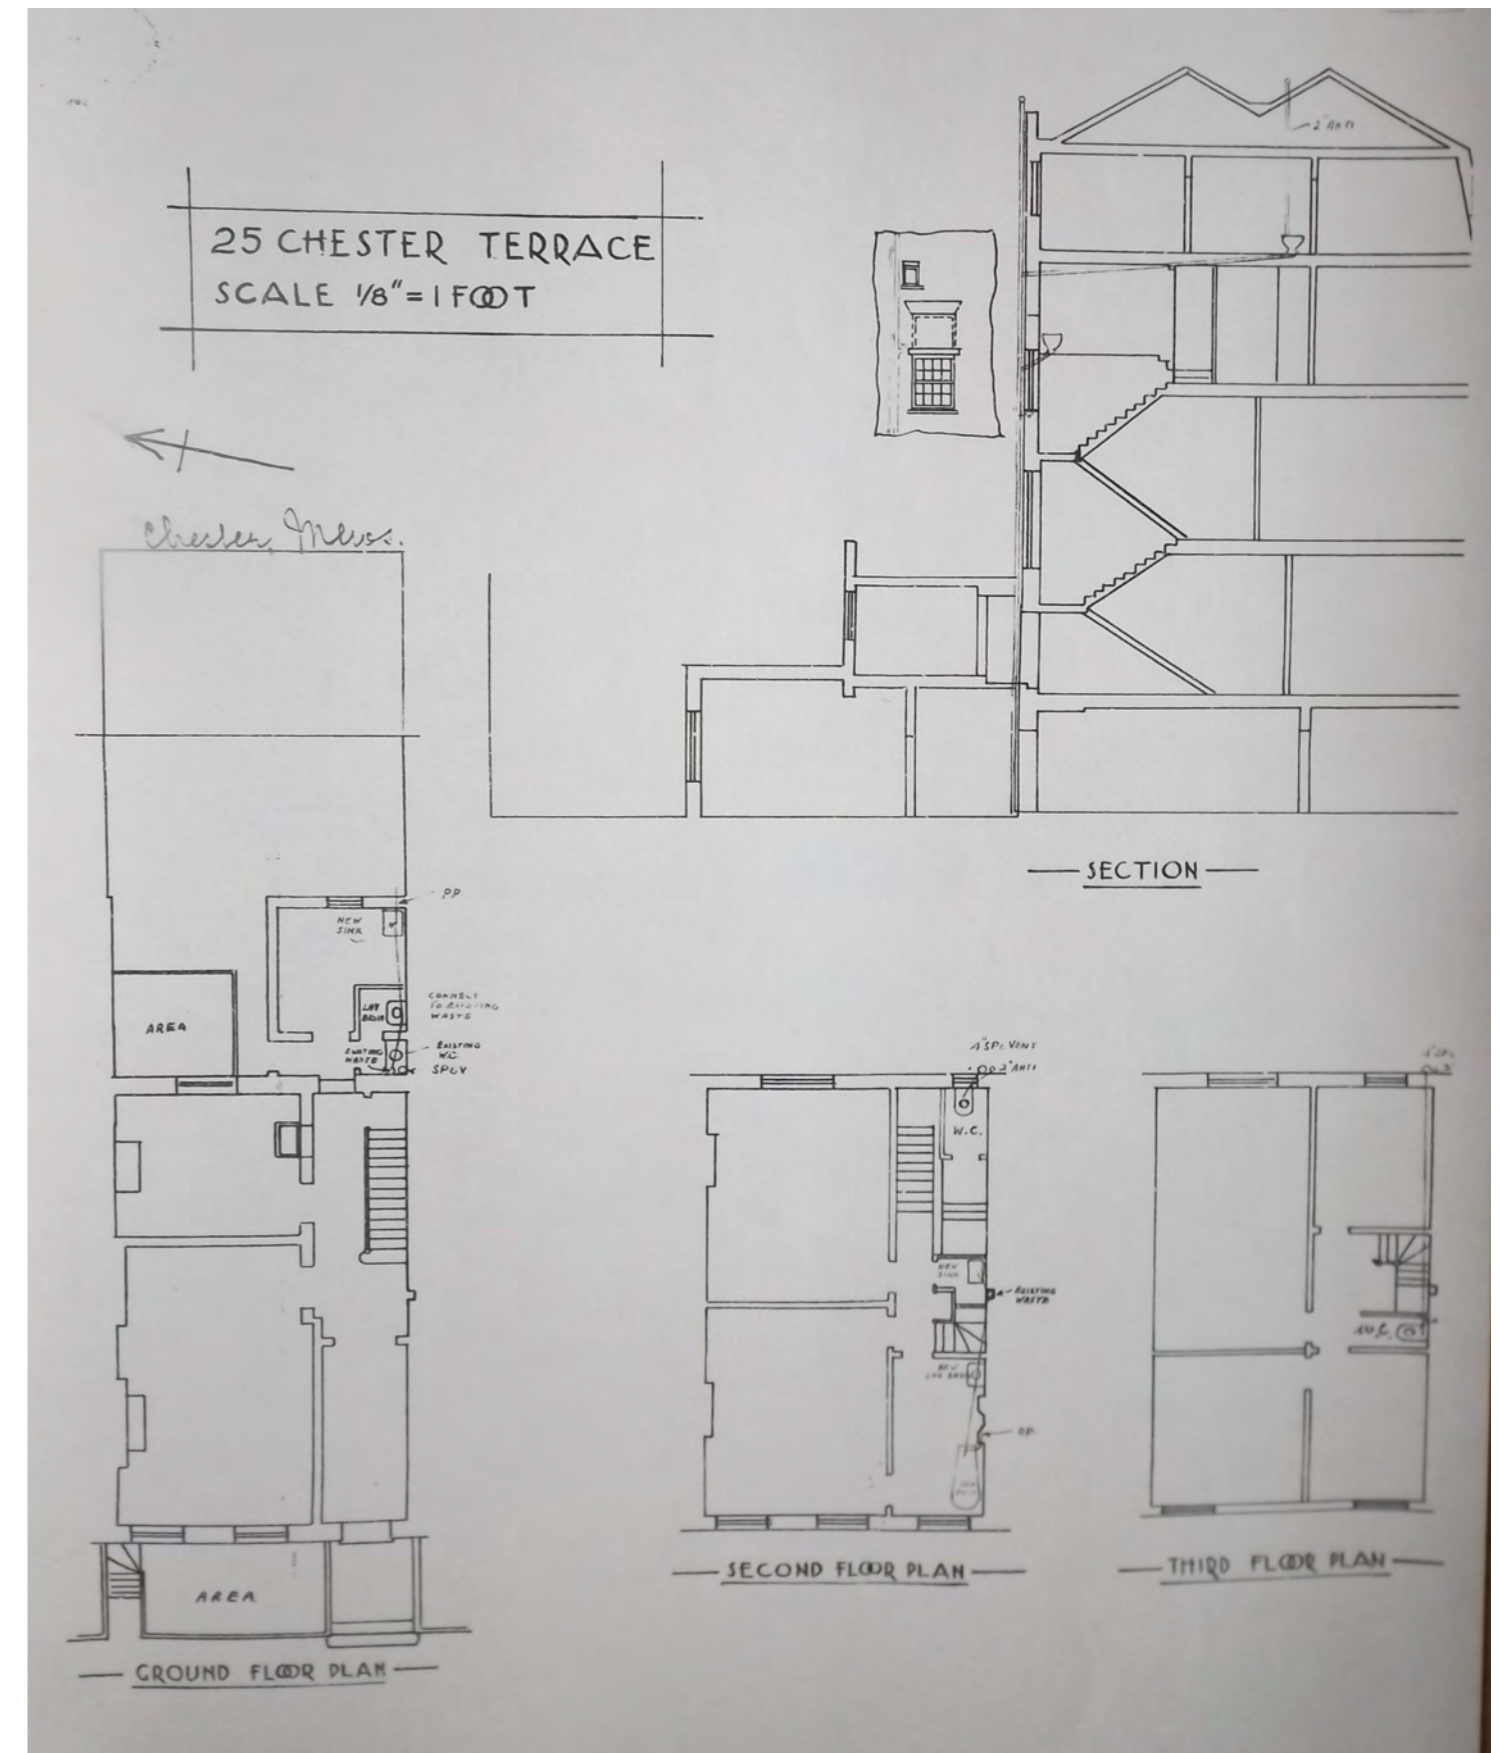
1924 Drainage Plans of the ground, second and third floor and a section
